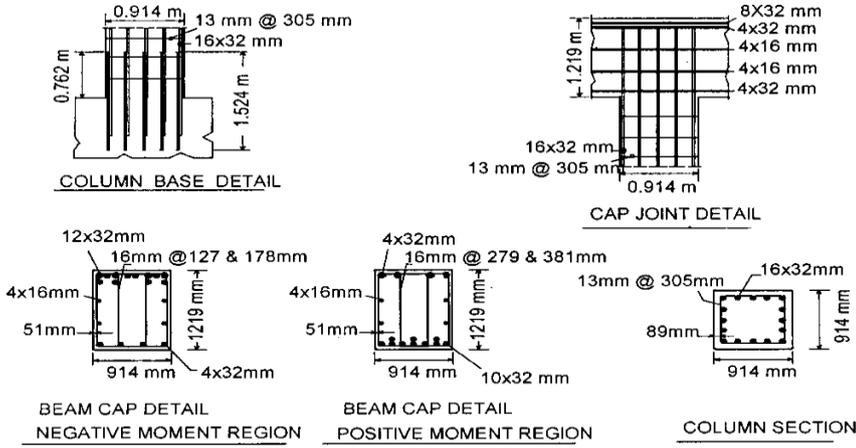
Column and cap beam cross-sections (Pantelides & Gergely 2002).
